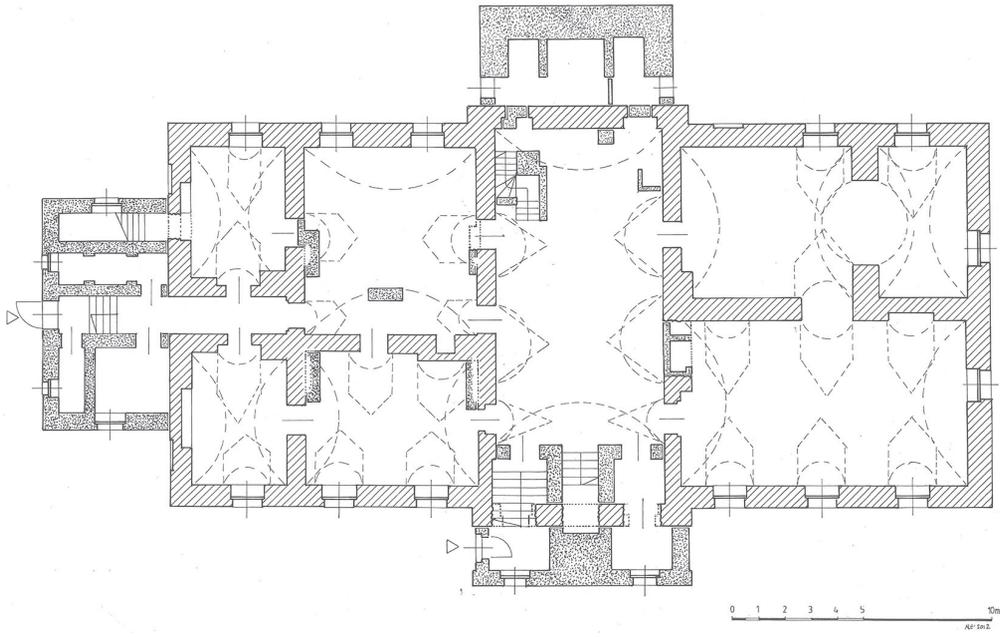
Rychnów (pdep Namysłów), palace, first floor plan with chronological wall stratification.
